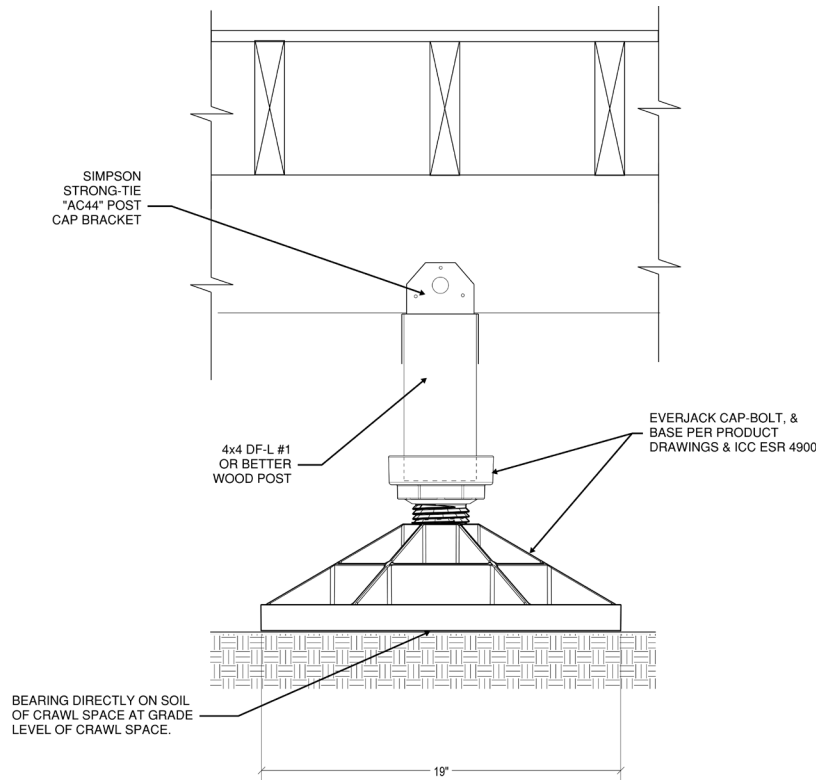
ORIGINAL EVERJACK TYPICAL INSTALLATION EXAMPLE
